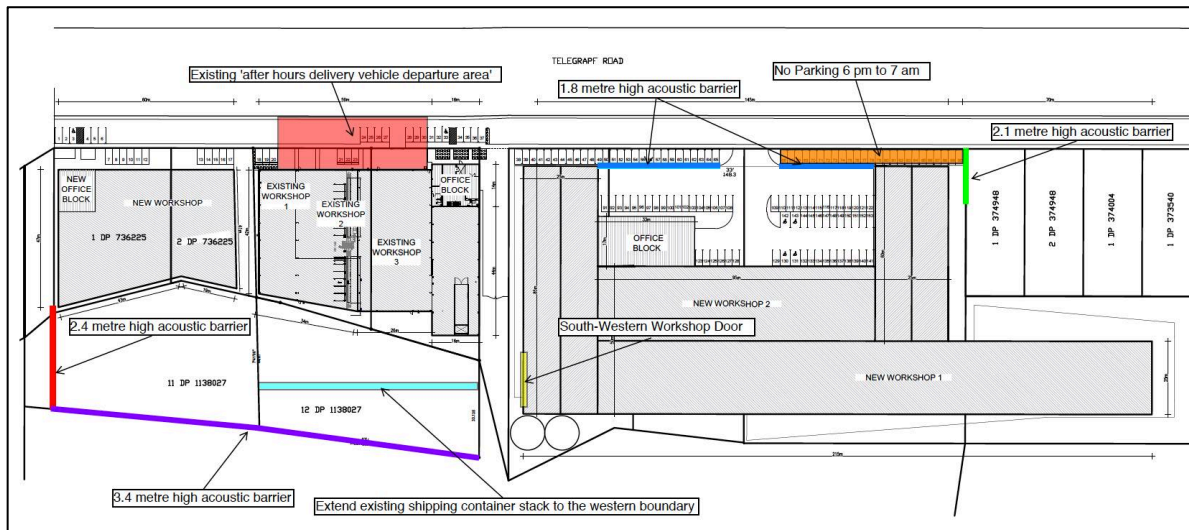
Concept Acoustic Treatment Site Plan (Source: DayDesign2021)
